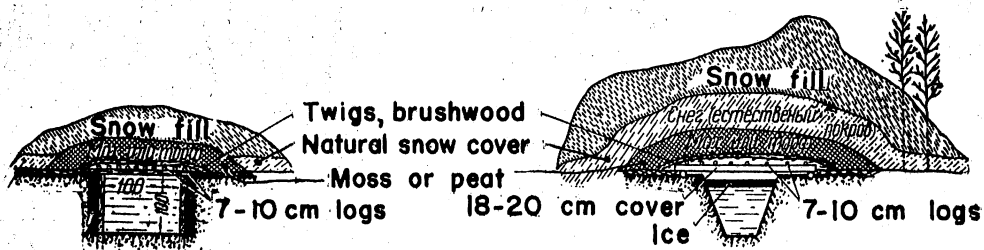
Insulation of Drainage Ditches, Amur-Yakutsk Highway
